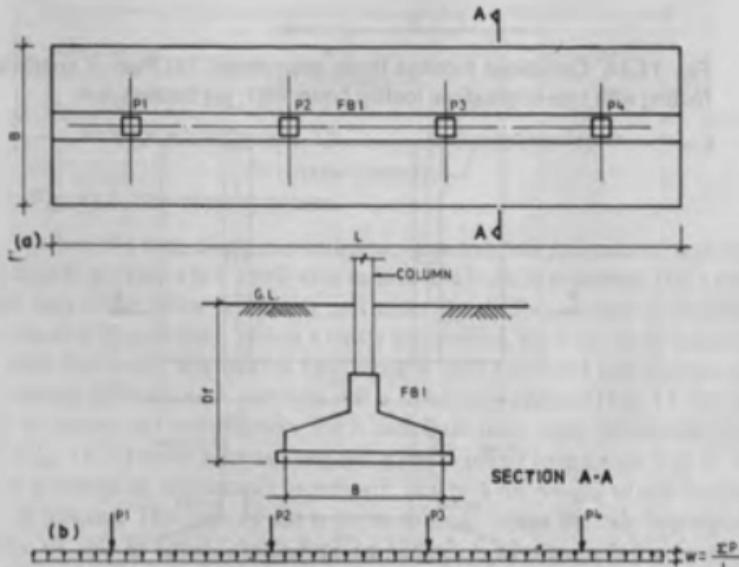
Strip footings with central beam $FB1$. (a) Plan of strip footing; (b) section A-A and longitudinal action of beam $FB1$.
